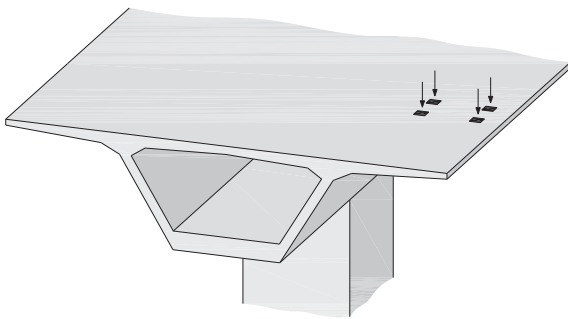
Cantilever bridge deck slab subjected to concentrated loads.
